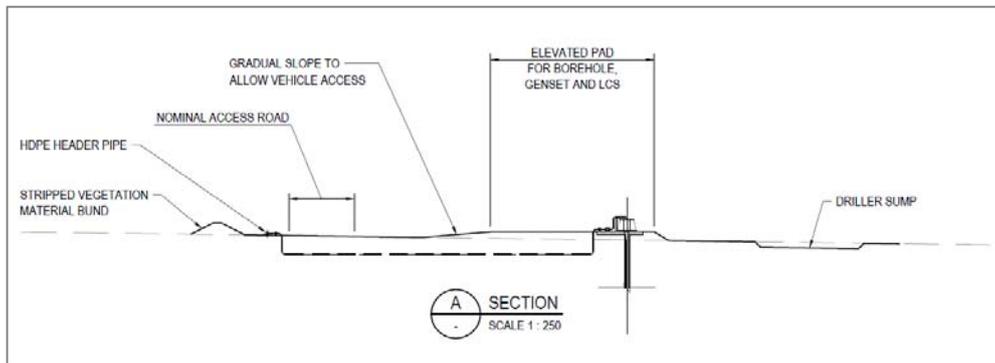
Typical Borehole Pad with Pipeline Cross-section
